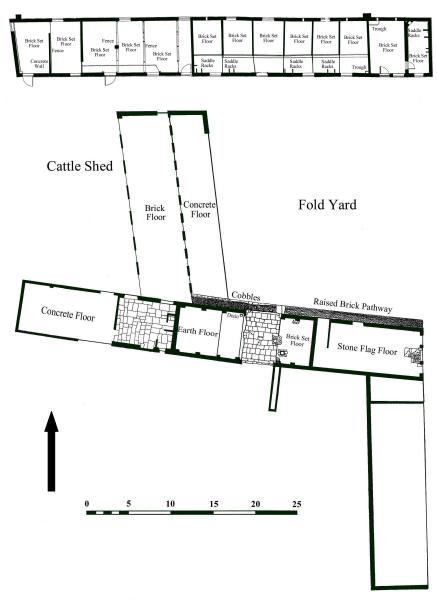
Plan of the Merryhill farm buildings showing the stable and barns, the cattle shed and front garage
